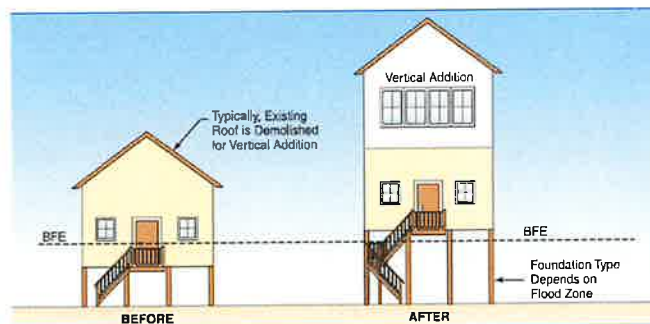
Vertical addition to a pre-FIRM residential building (in any zone) – the proposed work is a new upper story that involves structural modification. The work is a substantial improvement. The building is elevated to or above the BFE on a compliant foundation.
